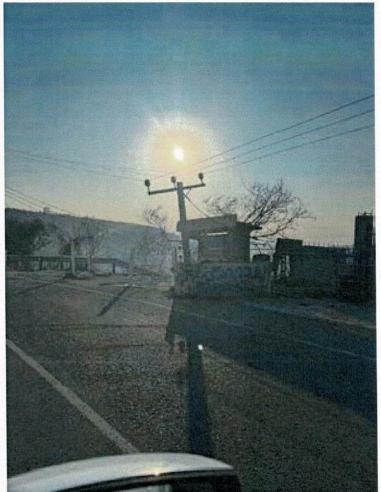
Example of fire damaged electrical infrastructure provided by EAC
